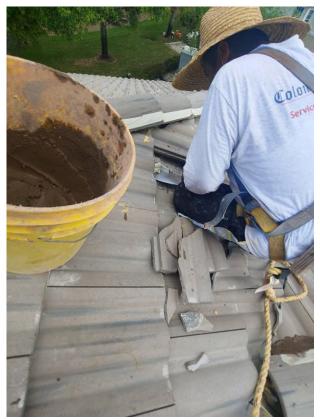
Mortar adhesive application was in progress surrounding the exhaust vents and pipes on building 21700.
